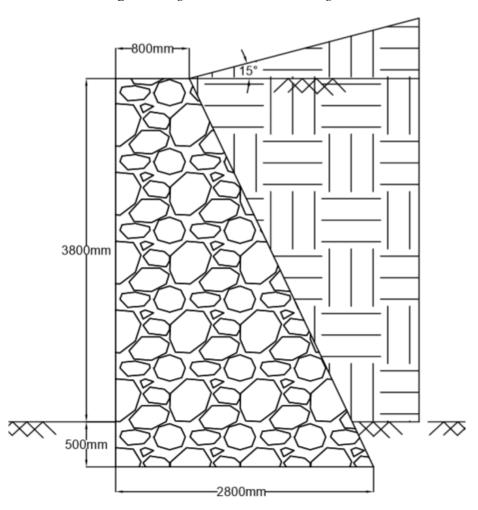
Final calculated dimensions of gravity retaining wall.
